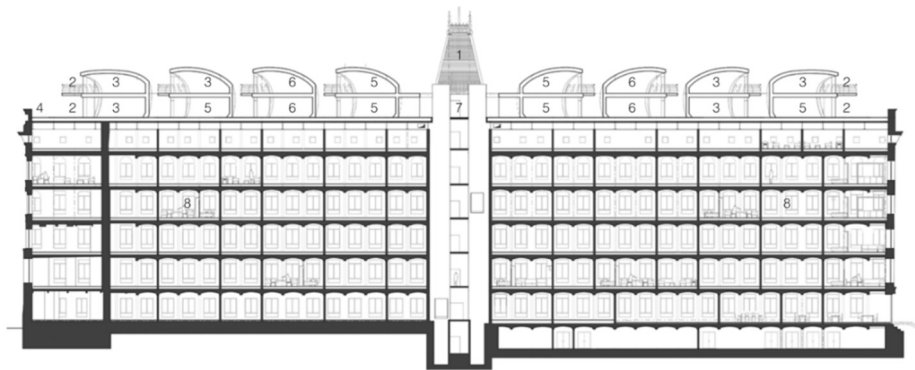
Section drawing of the refurbished Lister Mills building, showing the completed rooftop development. (© David Morley Architects)
